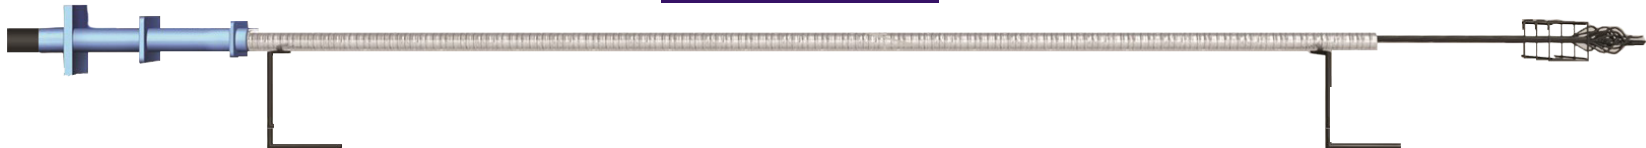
# DETAILED VIEW OF OUR P.T SYSTEM COMPONENTS
